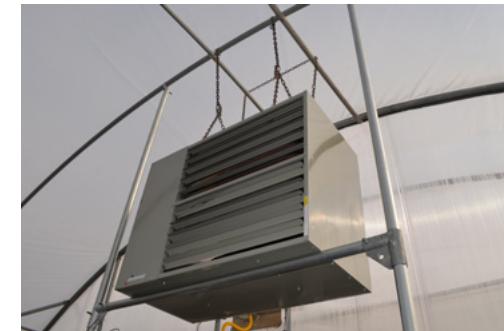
Natural gas heater mounted from the ceiling with a stand for additional support.
